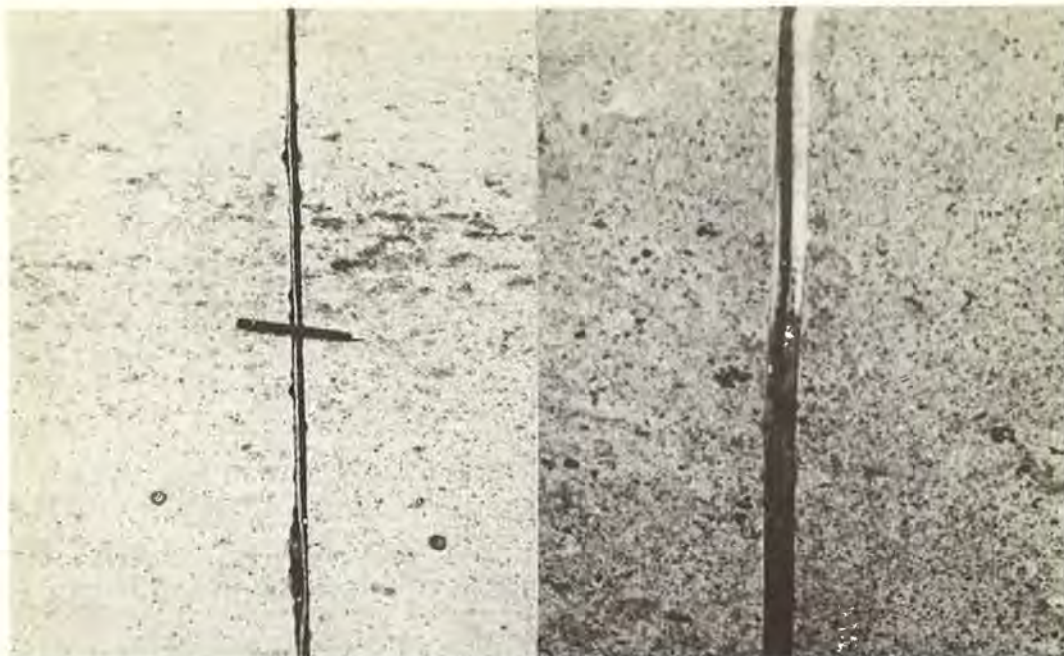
Typical condition of contraction joints in winter with bituminous premolded fiber strip, Series 1A, 60-ft. contraction joint spacing. Winter 1944-45. (Left) open to permit intrusion of inert material. (Right) snow and ice forms in joint.
